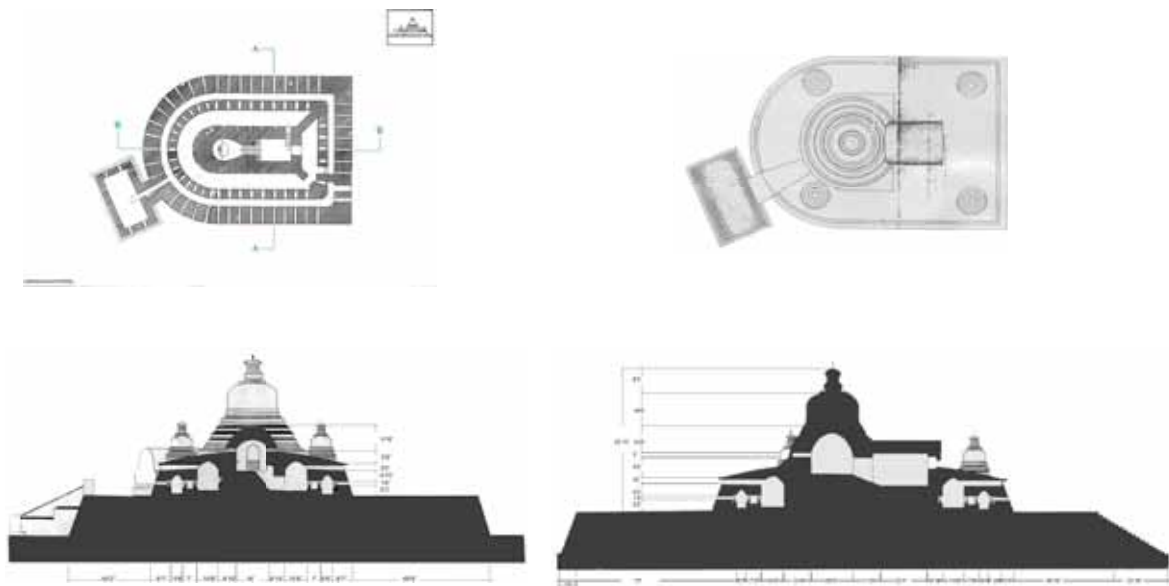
Ground plan, roof plan, cross section A-A and B-B of Htukkan Thein temple
